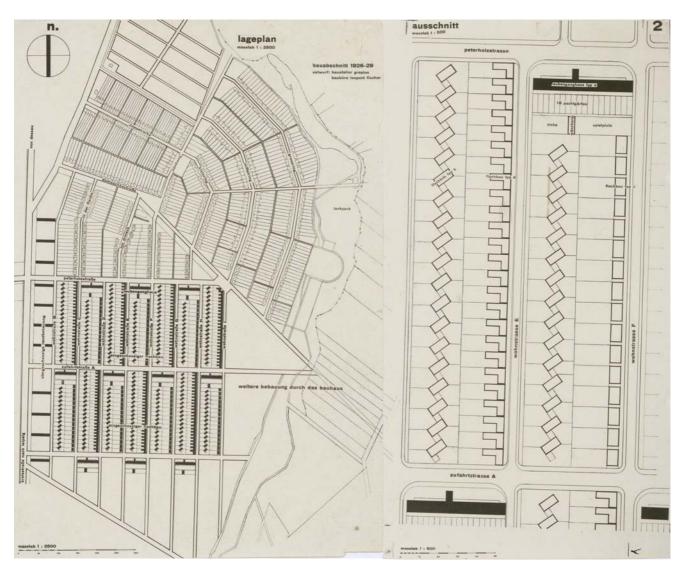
Site plan of the Dessau-Törten Estate and section of the estate with mixed development, plan 1930, Bauhaus-Archiv Berlin
